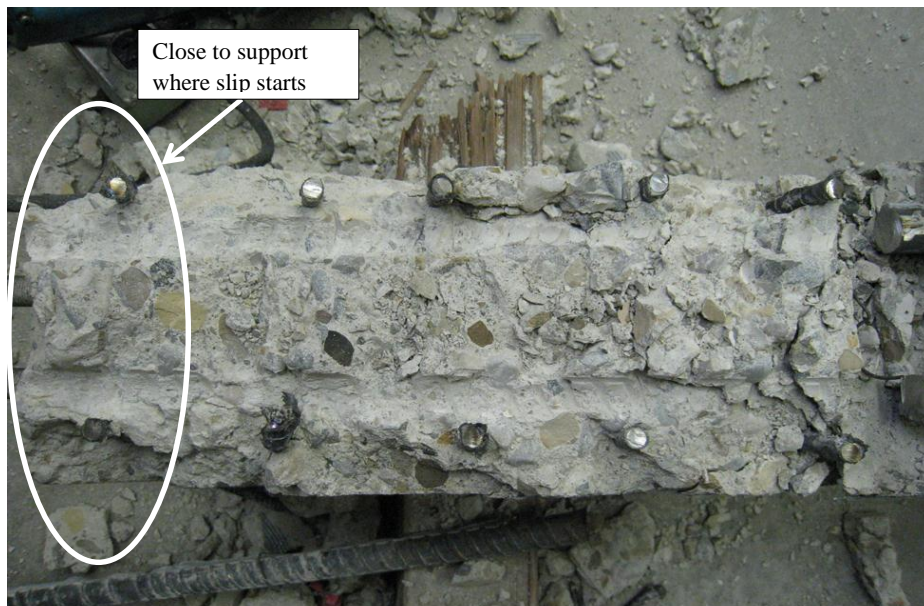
Dissection of Beam M-B-100-0-2 after failure showing the crushing of the concrete keys above the reinforcing bar. The beam is upside-down.
